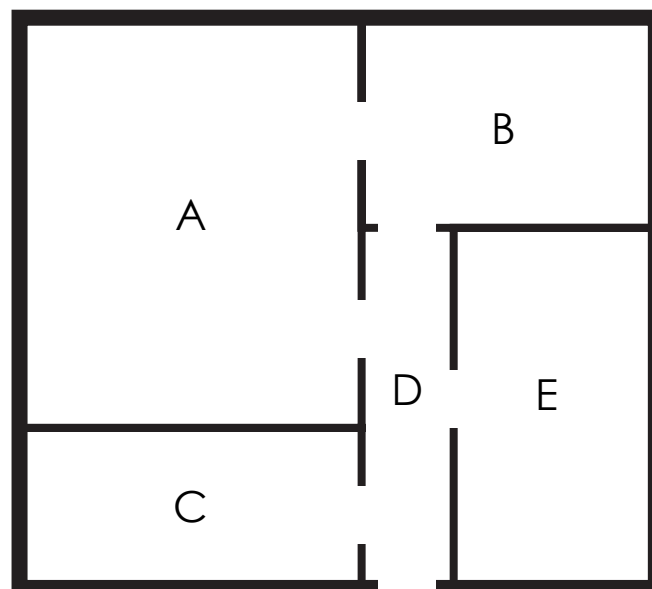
1 Western type of layout of wall based space configuration generating "rooms" A, B, C and E, and "corridor" D.
